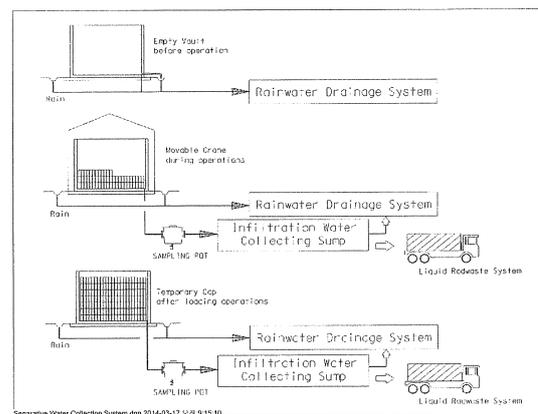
Separative Water Collection System in the surface disposal facility (l'Aube Facility)
